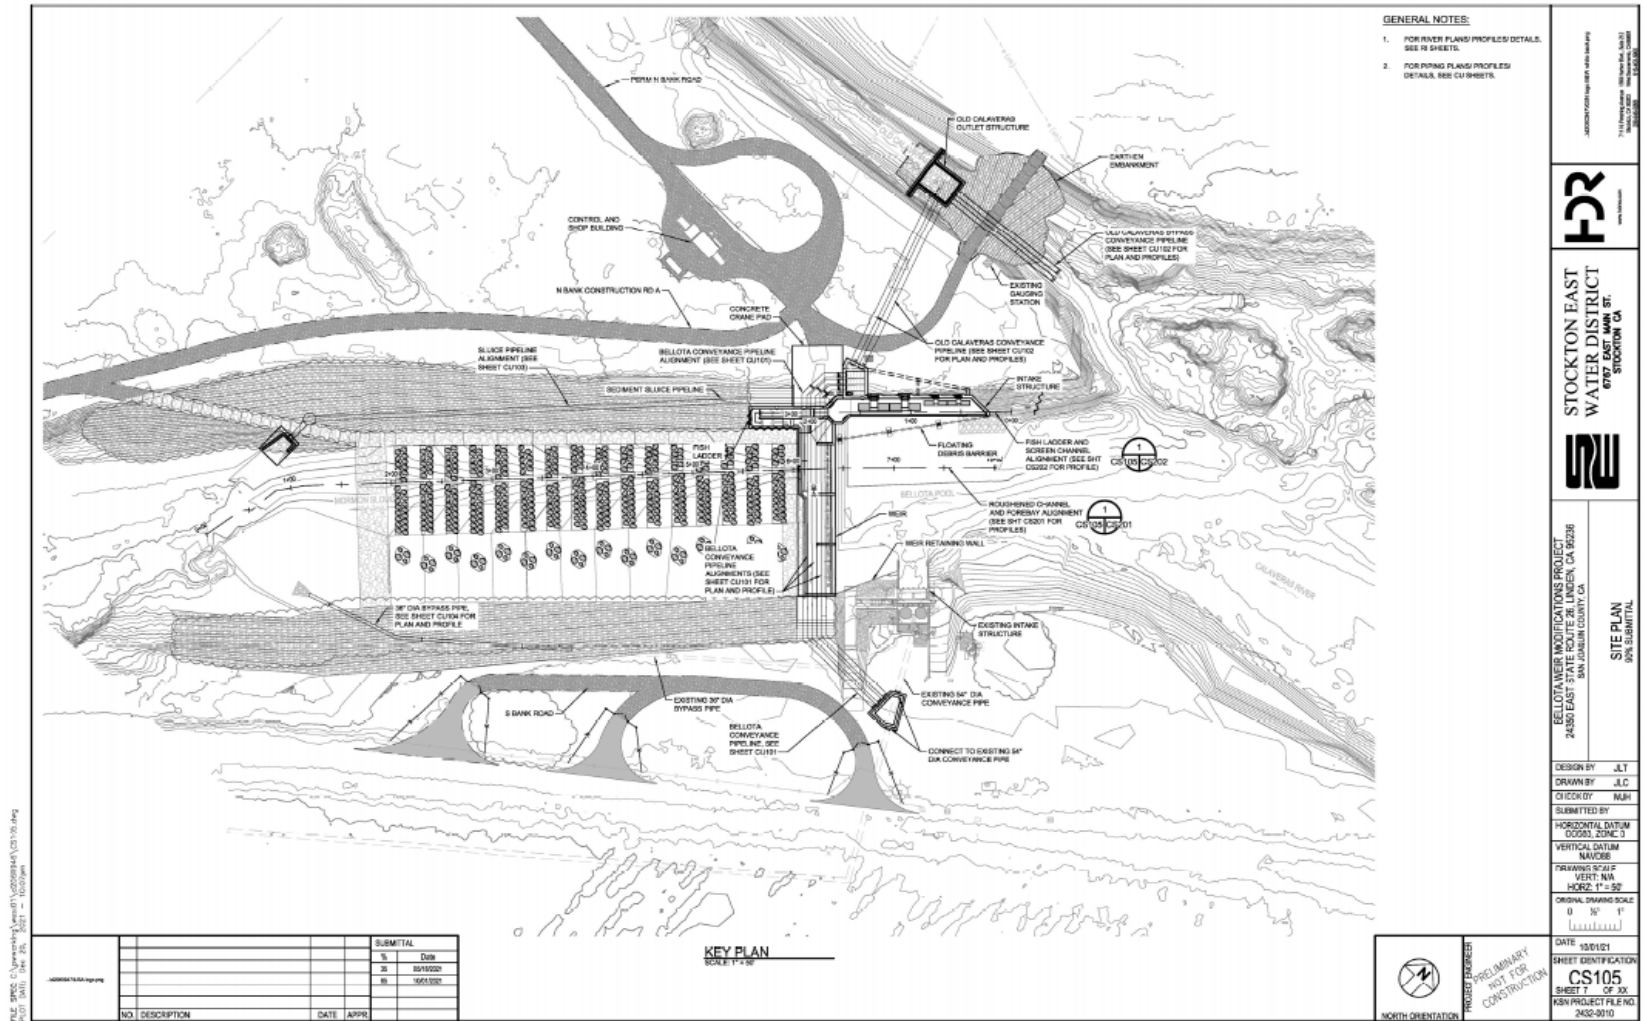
Project components and overall layout of the Bellota Weir Modification Project
